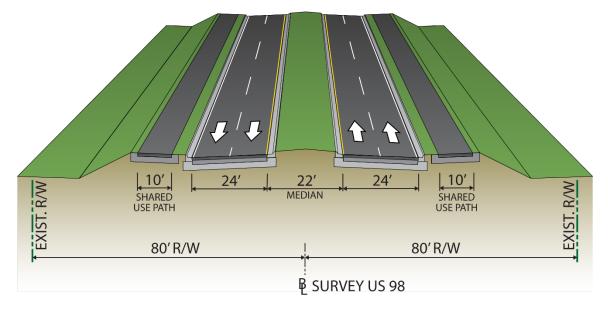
Proposed US 98 C3R (Suburban) Typical Section
